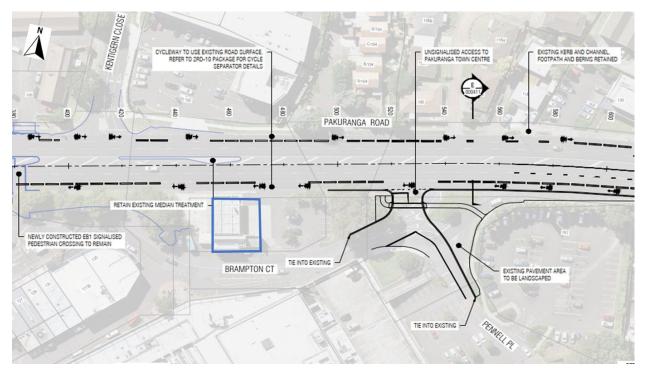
141 Pakuranga Road (blue outline) upon completion
